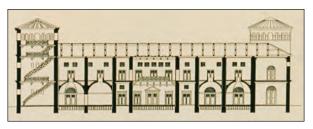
Section of room No 1 on the earlier reconstruction drawing (HAJNÓCZI-MEZŐS 1991)
